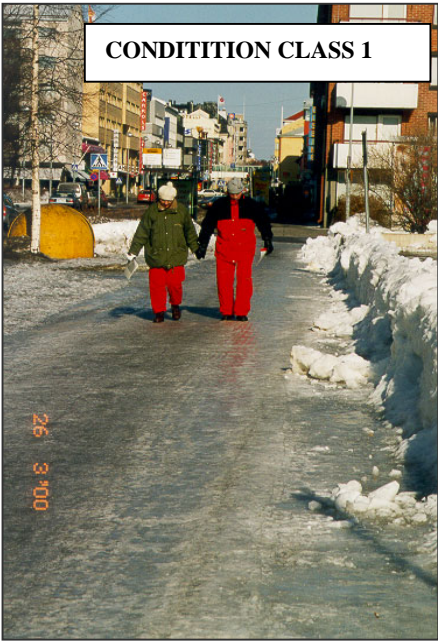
An ungraded pavement received better marks ... Figure 10 ... than a graded one.
